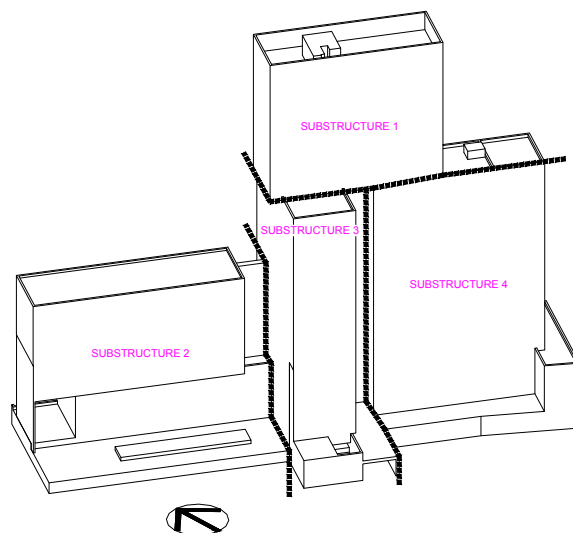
Multi-blocks (substructures) approach used in wind tunnel study.
